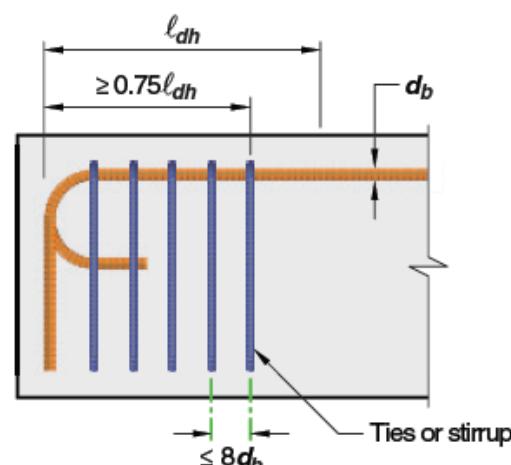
Confining reinforcement placed perpendicular to the bar being developed, spaced along the development length ℓ_{dh} , that contributes to anchorage strength of both 90- and 180-degree hooked bars.
